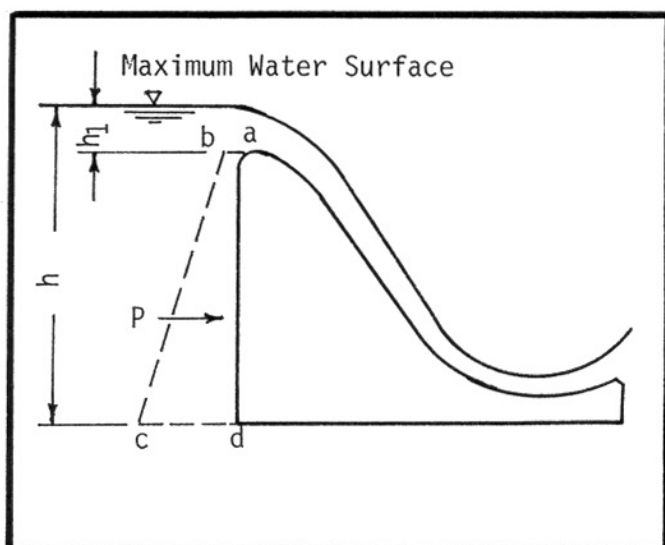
Water Pressure on an Overflow Concrete Dam (From Design of Small Dams)
